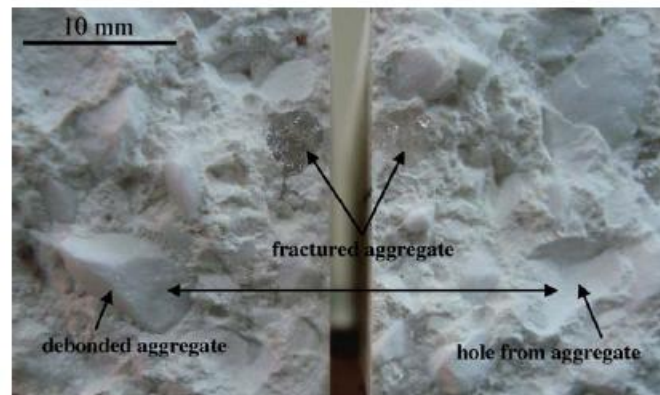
Photograph of the fractured sample showing: matrix (fine fraction), fractured and debonded aggregates (coarse fraction), and hole produced by pull out of the aggregate[46]
